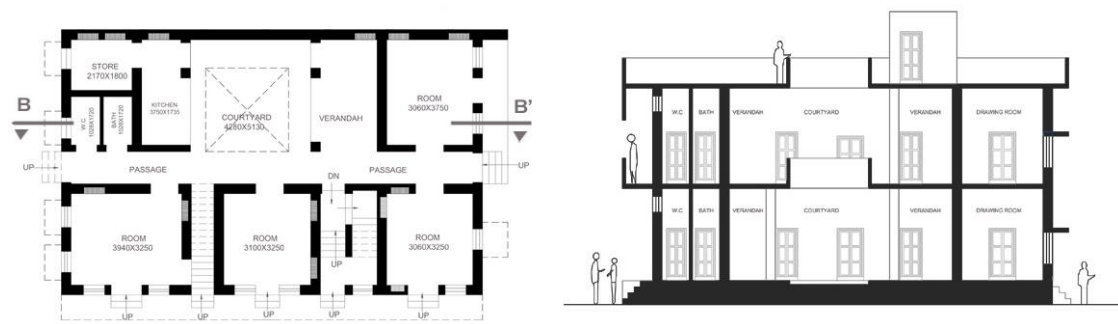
Plan & Section of Prototype Unit 2 (Corner House)
